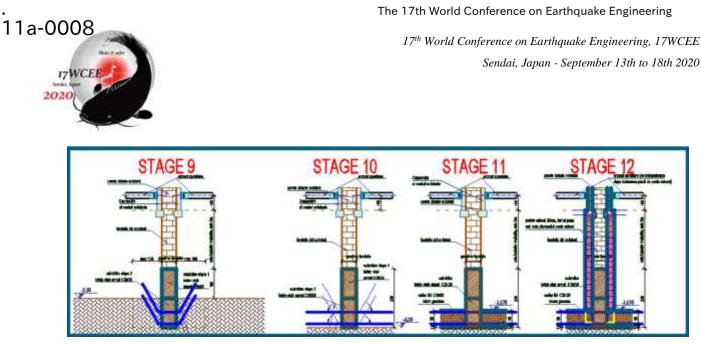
Execution stages of the basement level under the existing foundations [15]
